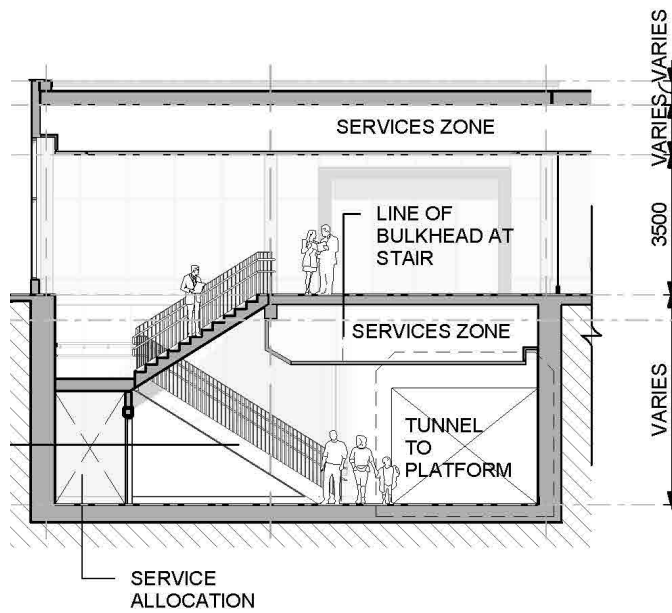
Cross Section of Platform Access Module (Tunnel configuration)
